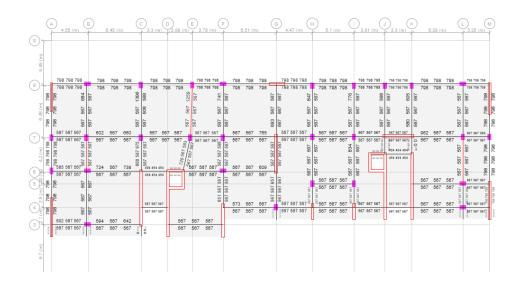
Concrete frame design ETABS output (Longitudinal reinforcement, plan view 7<sup>th</sup> storey level)
